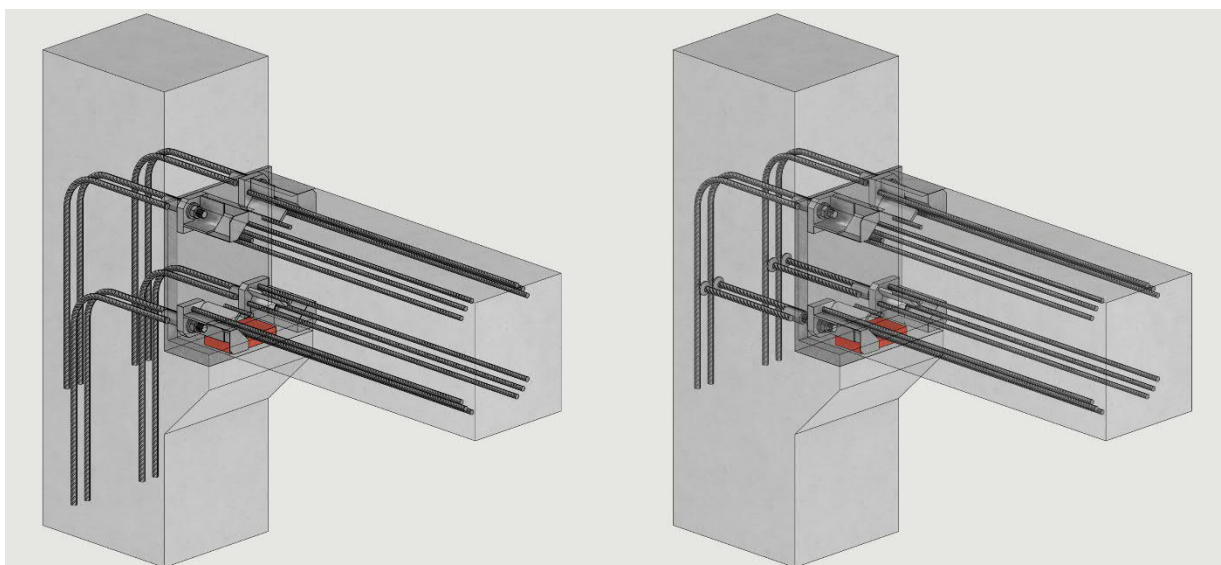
Typical structure of the APK-CM beam shoe in the rigid connection
